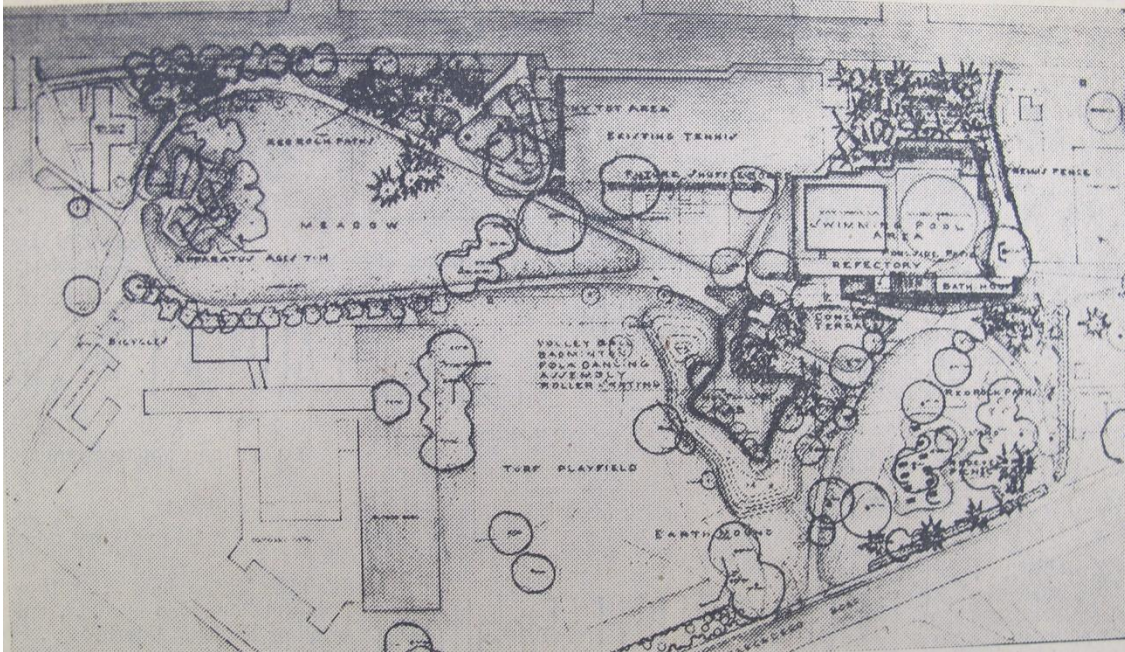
Eckbo, Royston, and Williams plan for park improvements. Of note, there was a picnic area west of the tiny tot playground and a picnic area at the southeast which are no longer extant. Source: "You'll Hardly Recognize the Park When This Job Is Done, *Palo Alto Times*, 9 February 1957.
